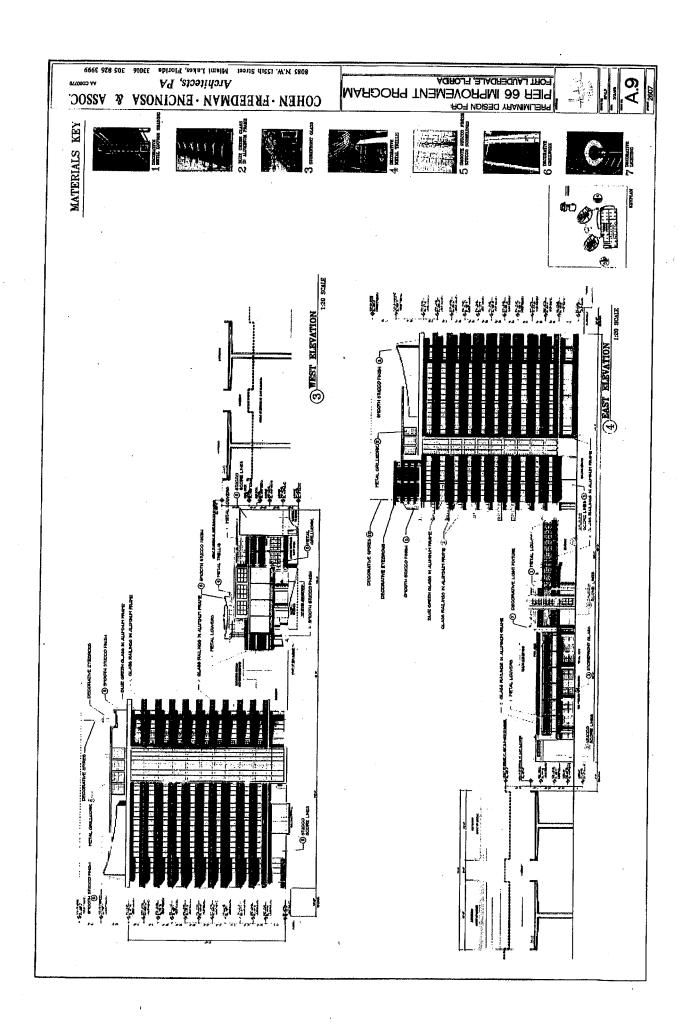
Second Amendment to Previously Approved Site Plan (Case No. R15043)
